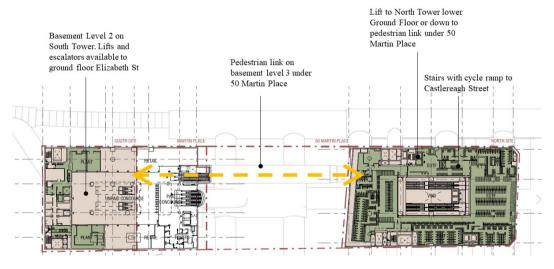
Internal pedestrian connection between South Tower and end of trip facilities
